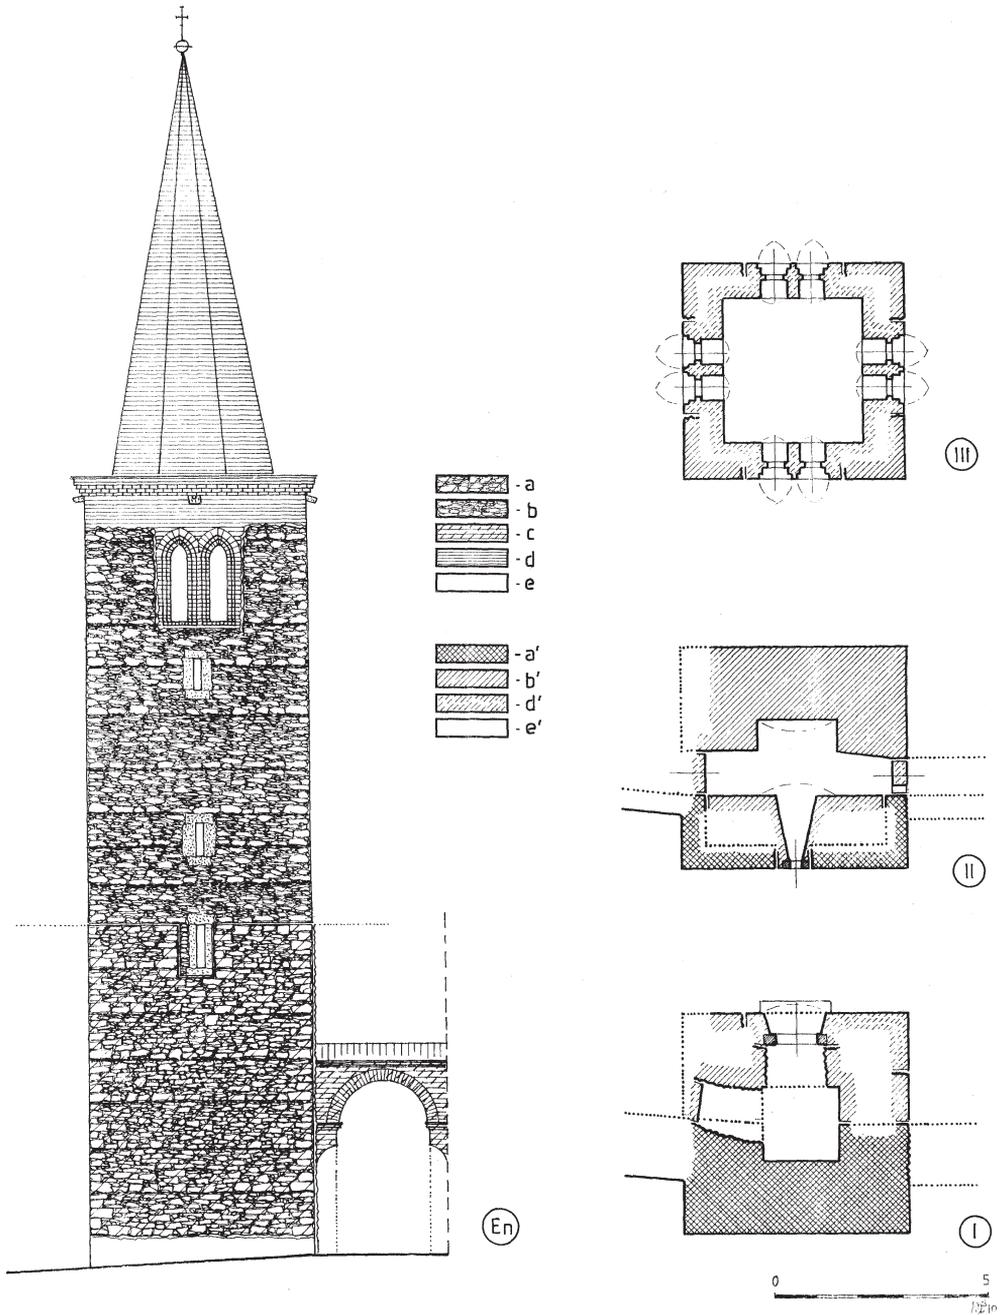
Bystrzyca Kłodzka, Rycerska (Knight's) Tower, north elevation (En) and projection of dungeon levels, sentry porch and bells (I-III) with chronological wall stratification (signs: a, a' – Gothic walls from the 14<sup>th</sup> century; b, b' – Gothic walls from the 15<sup>th</sup> century; c – Baroque walls; ; d, d' – walls from the 19<sup>th</sup> century; e, e' unrecognized walls (drawn by A. Legendziewicz)
